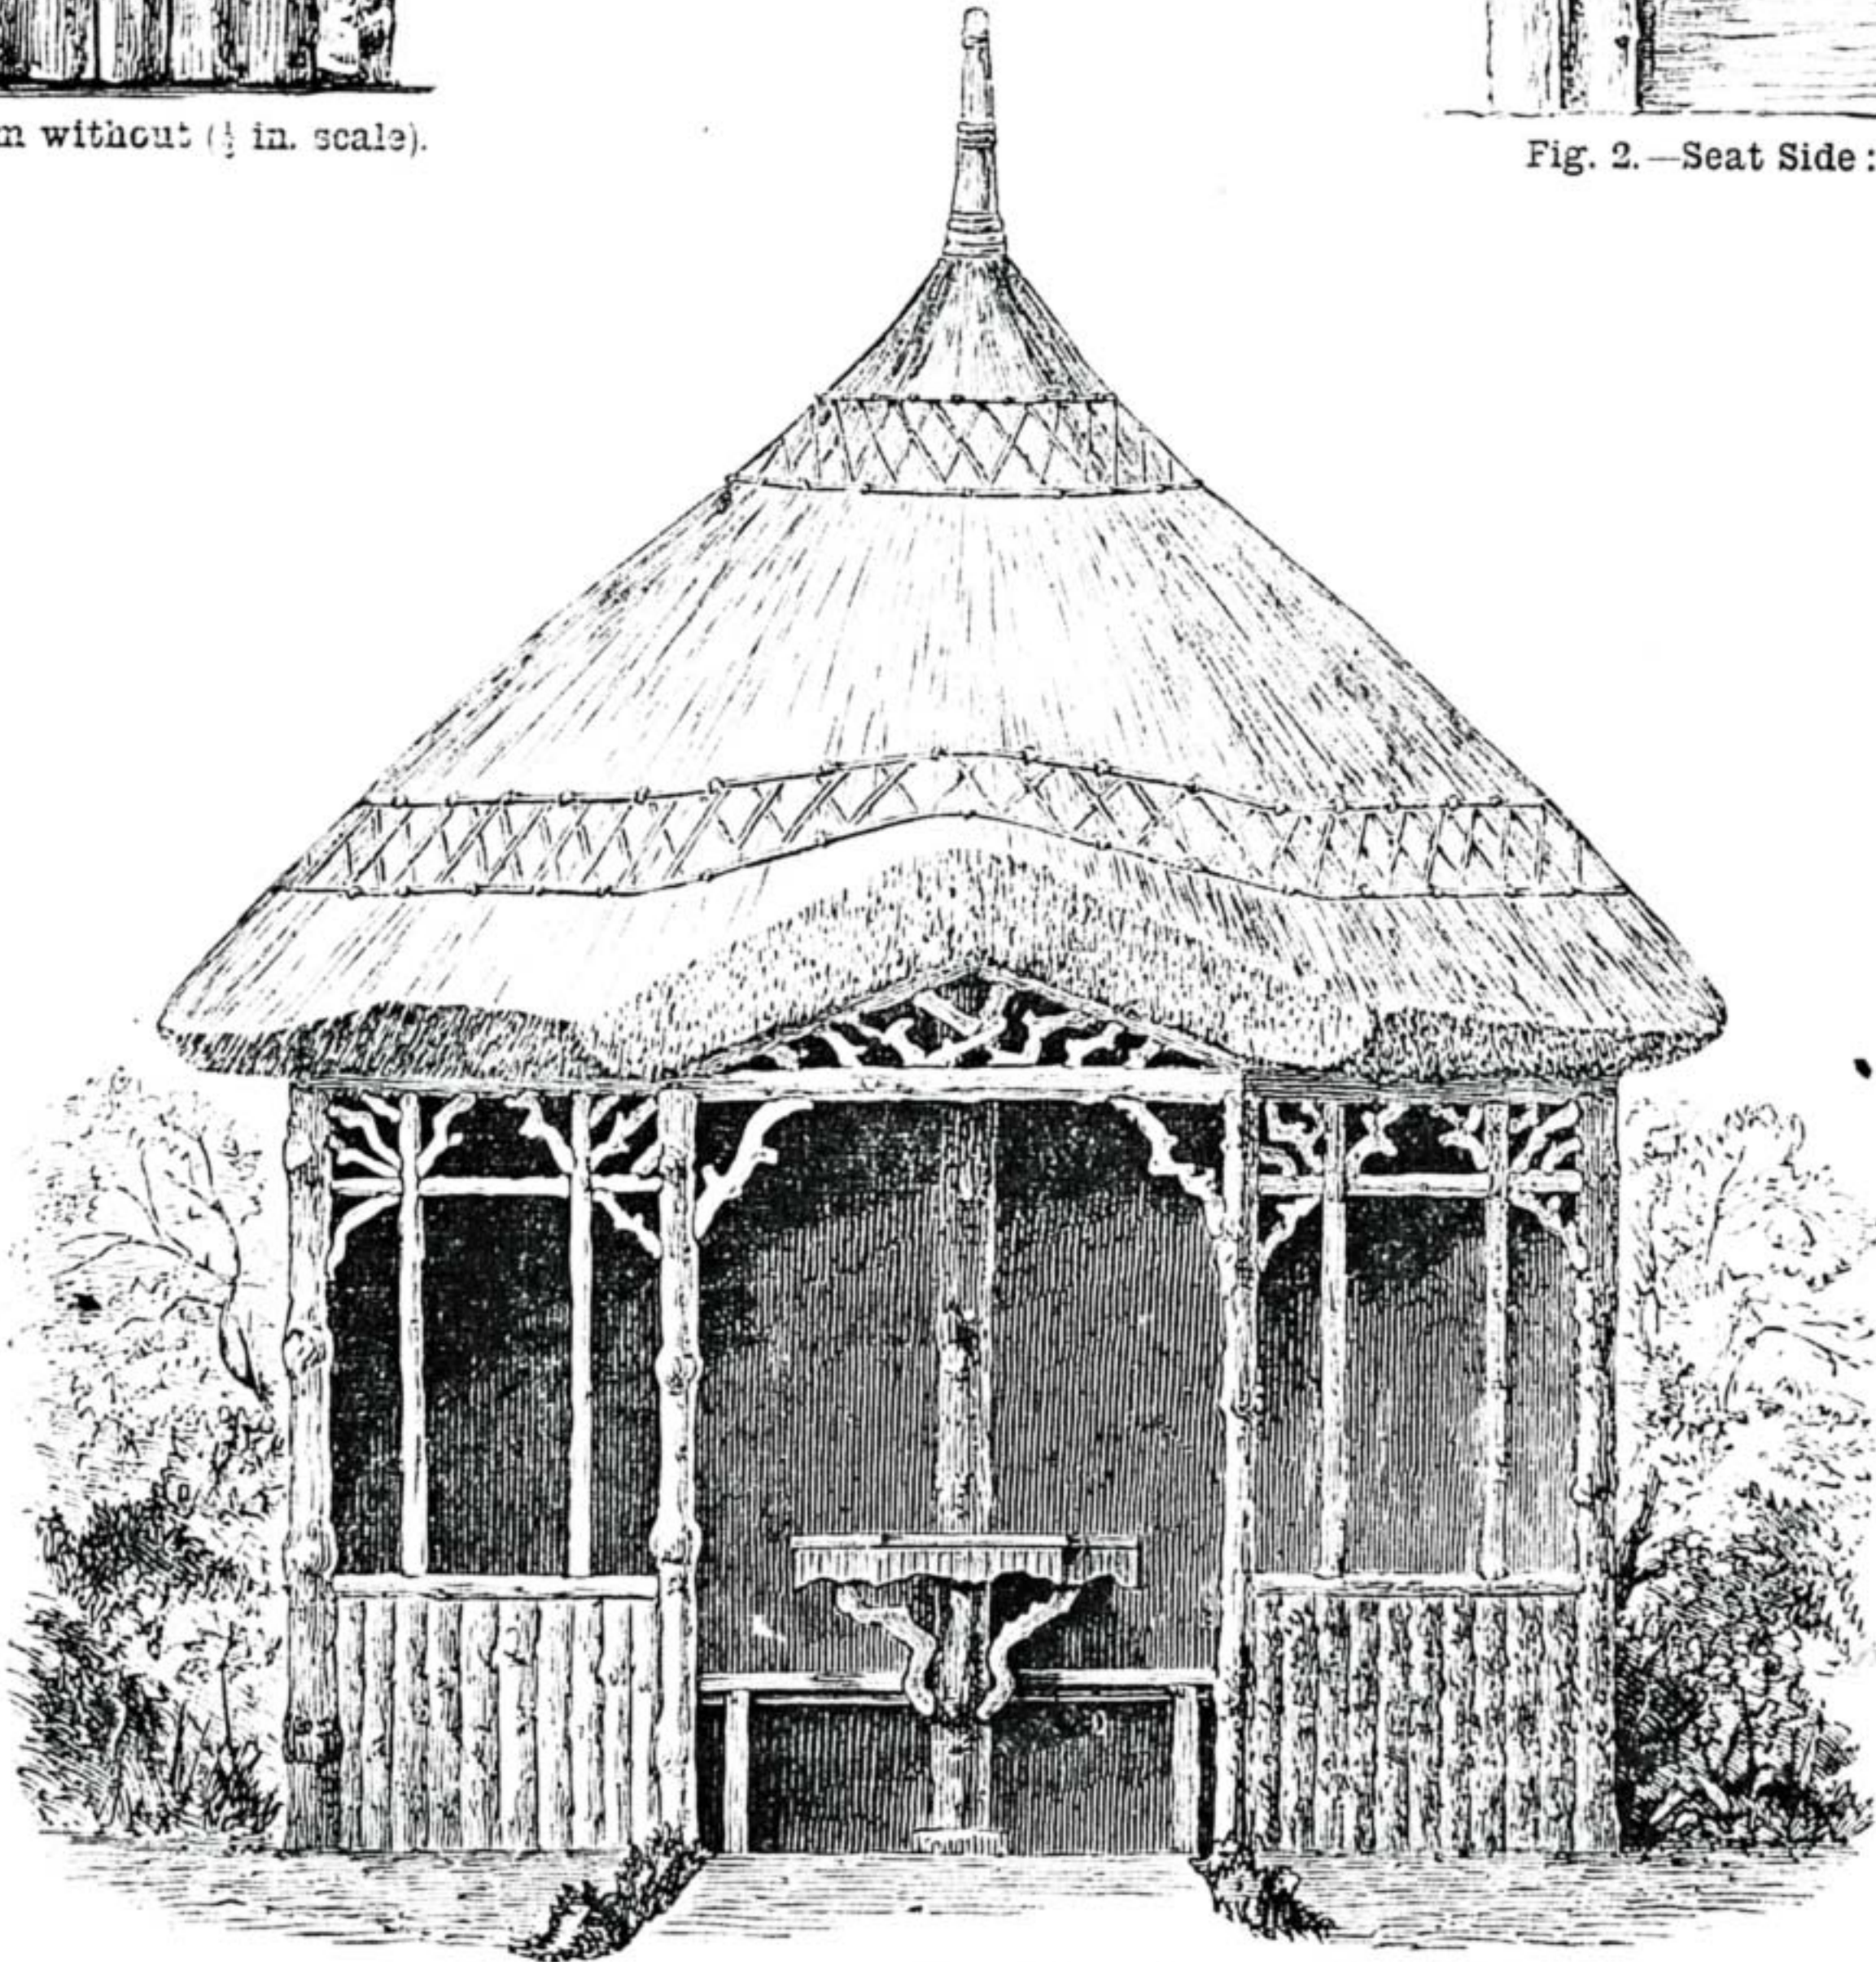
Octagonal Summer-House: Front Elevation on scale of  $\frac{1}{2}$  in. to 1 ft.
